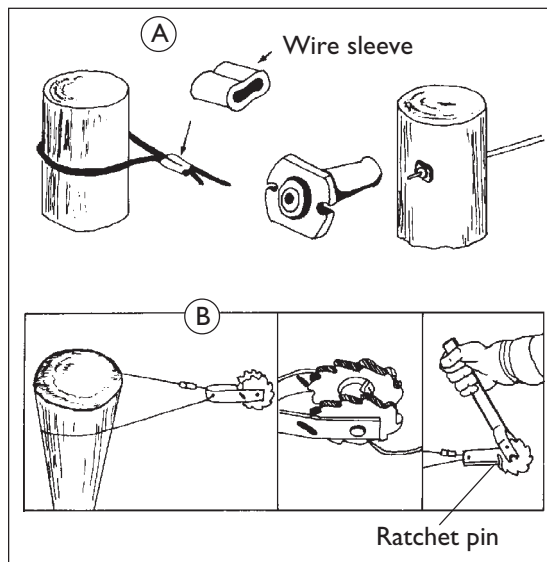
(left). Methods of fastening wire: compressible wire sleeves and “wire vise” (A) and in-line wire strainer (B).
